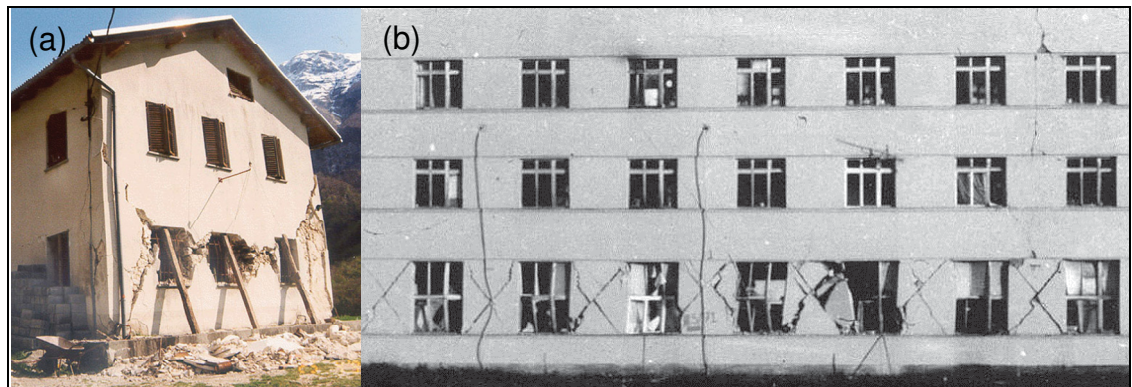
Photographs illustrating typical diagonal cracking damage for: (a) a stone masonry buildings and (b) a brick masonry building
